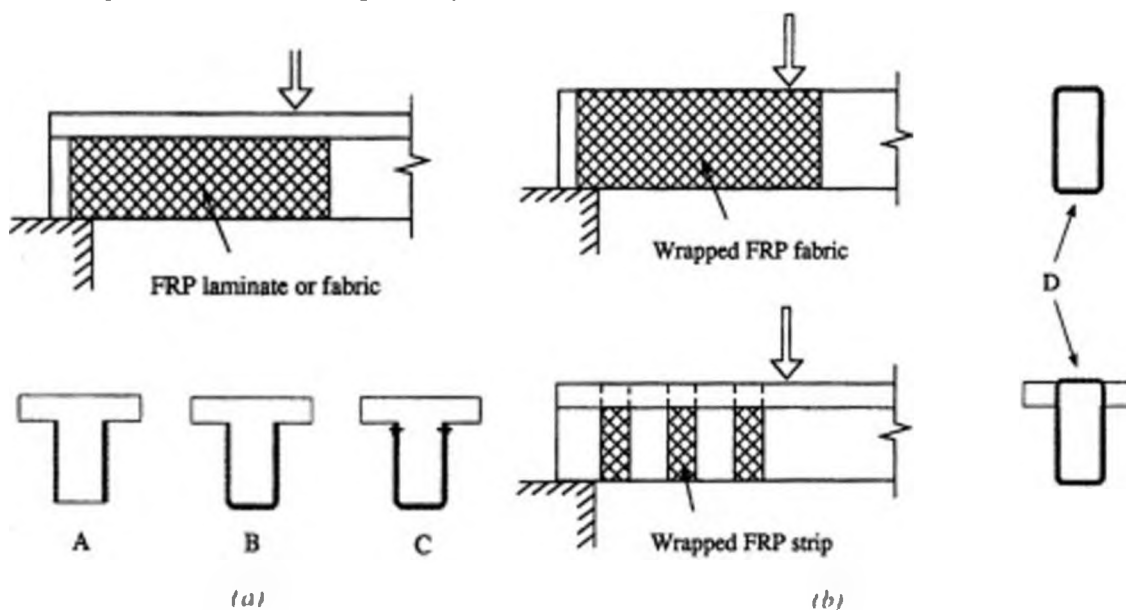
Concrete shear reinforcement with FRP: a) laminates or textiles (b) strips or bundled textiles
